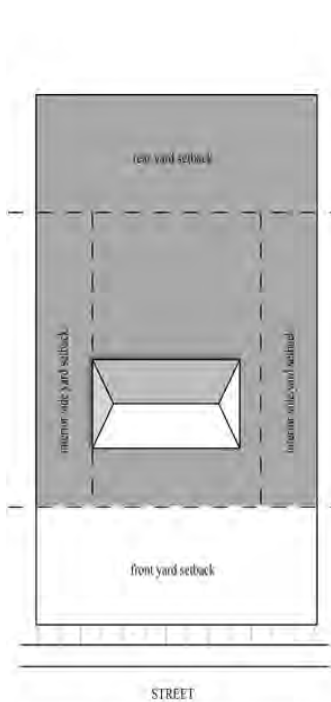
Residential Parking Locations: Interior Lot. Parking is allowed in shaded areas and on driveways in approved locations.
